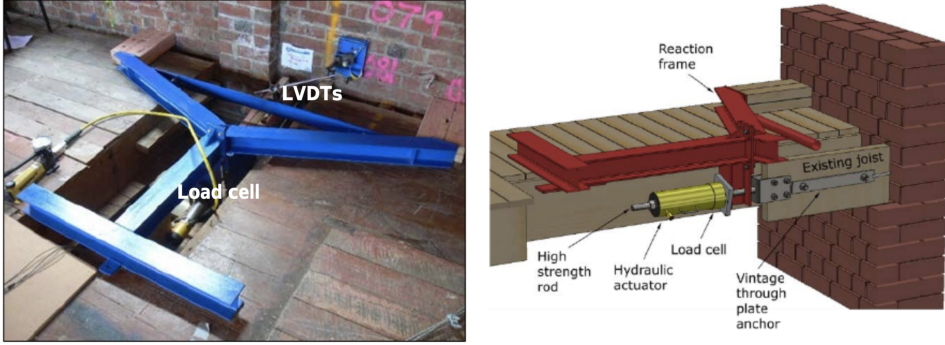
In-situ test setup for timber-masonry connections. From [57]
